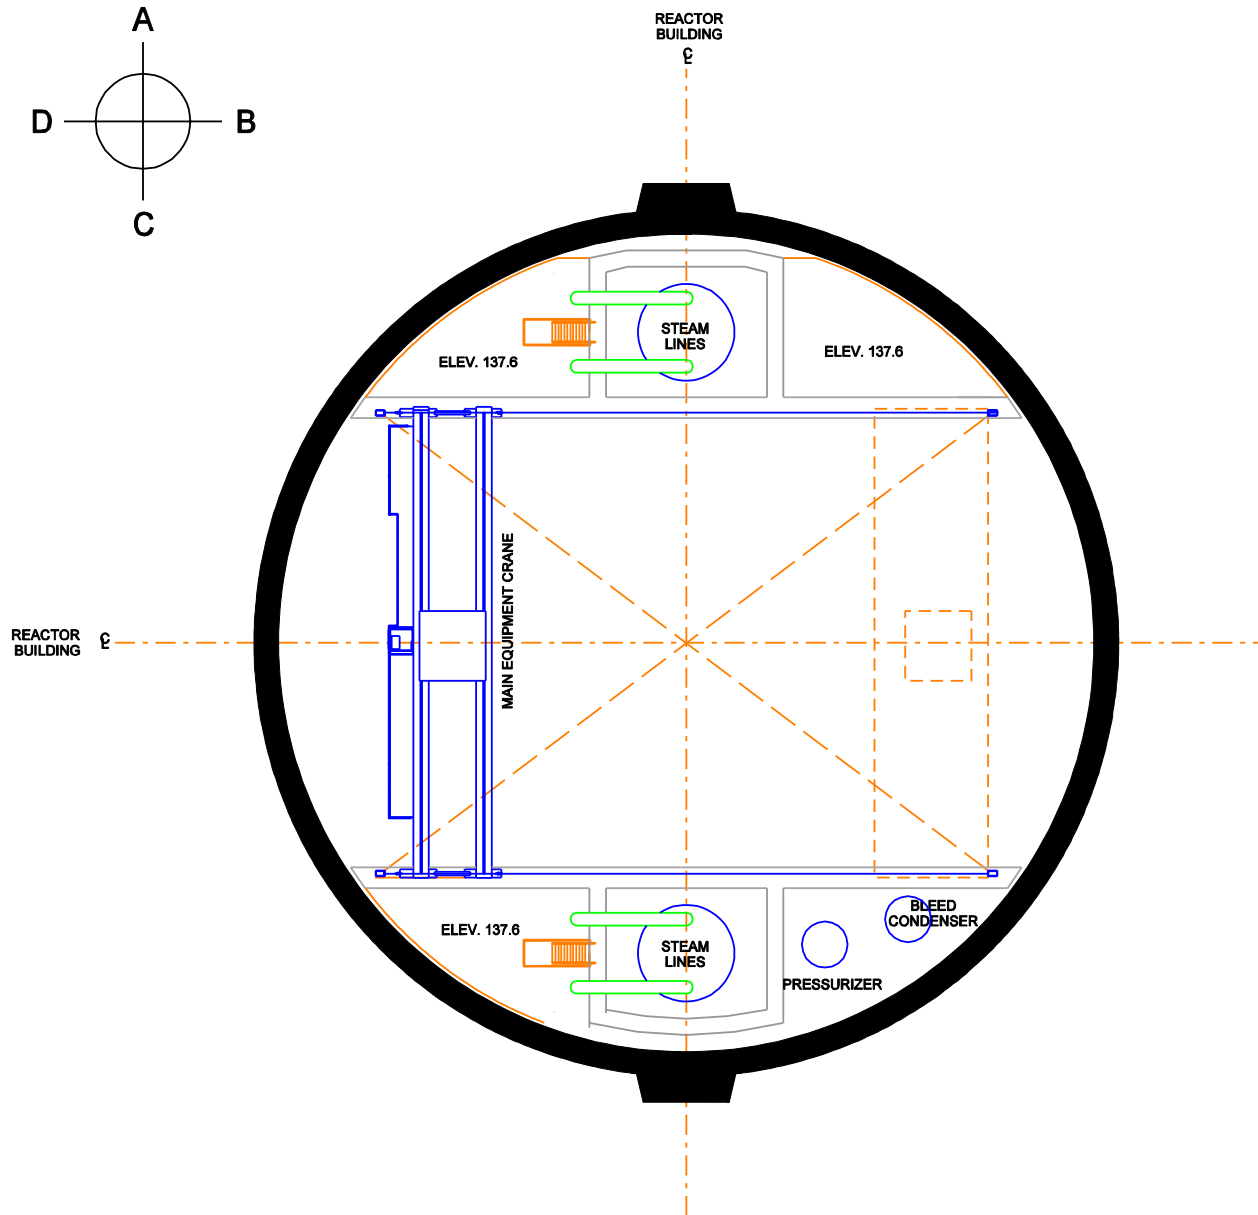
ACR-700 Reactor Building - Plan @ Elevation 138.8
